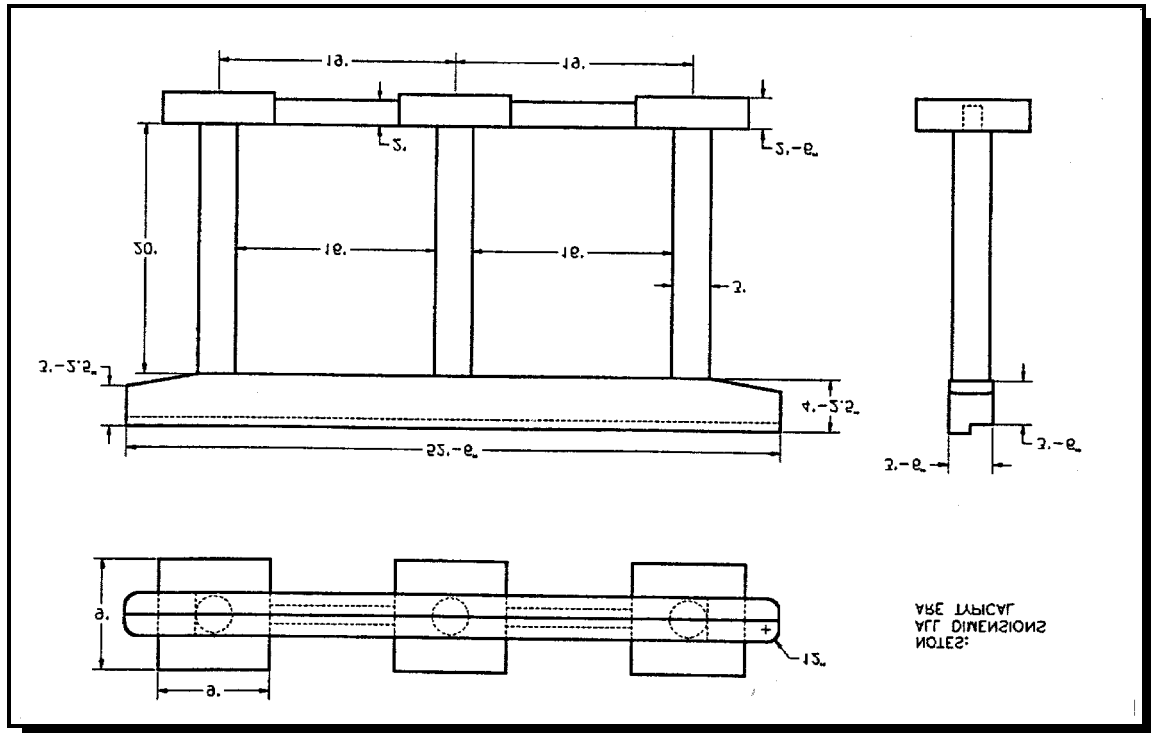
Schematic view of Westbound Pier #3. (Scale 1:200).
